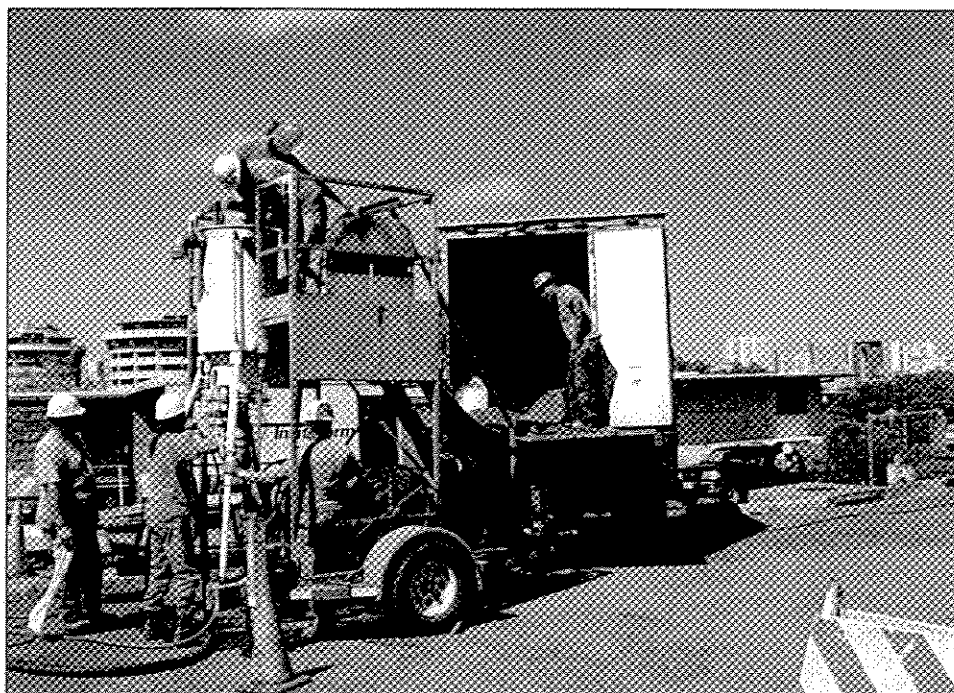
Cured-in-place pipe liner being installed through a manhole.
